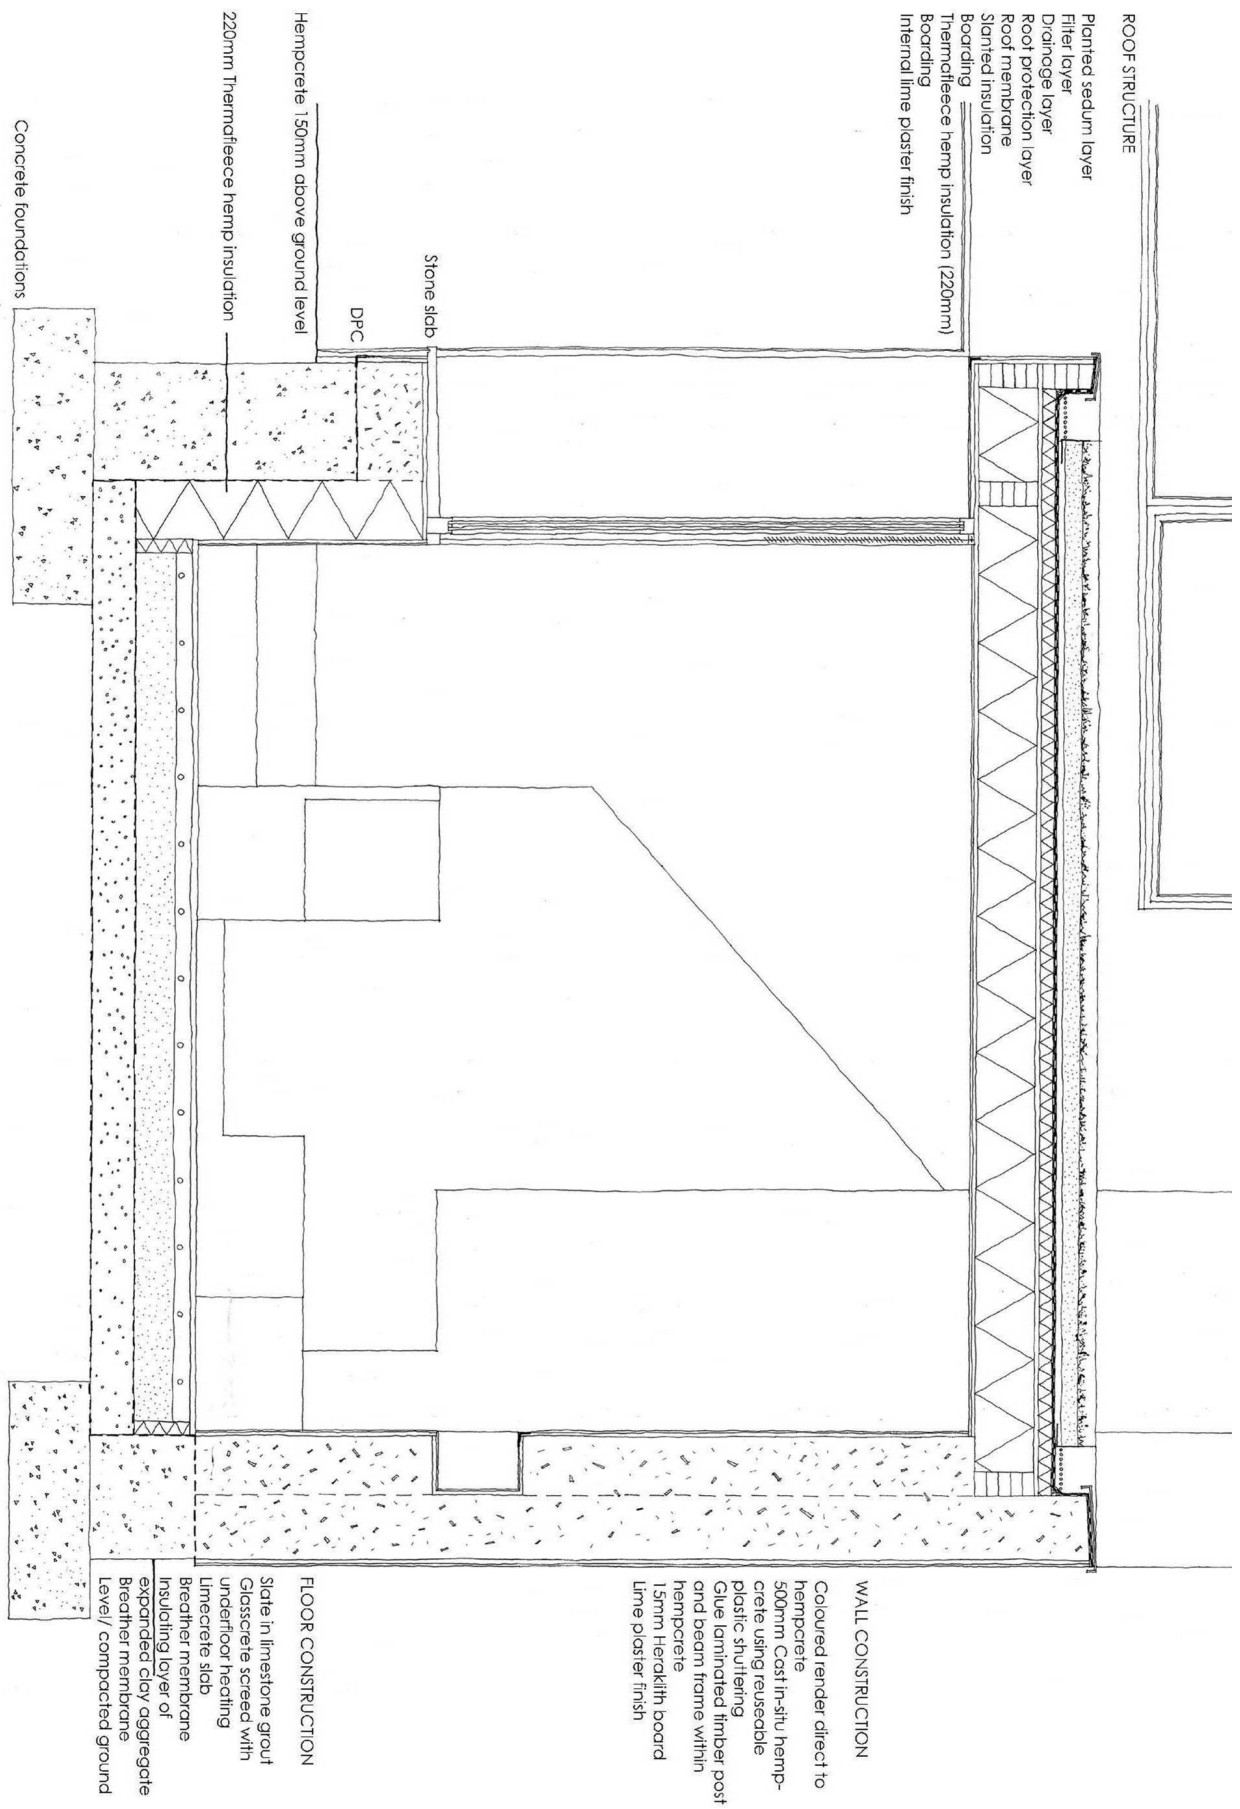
Construction section through living room of 3 bed house type off courtyard with external window seat
